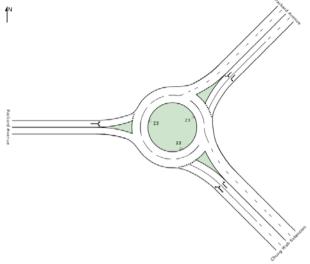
Sidra Model Layout Chung Wah Terrace Extension / Packard Avenue
